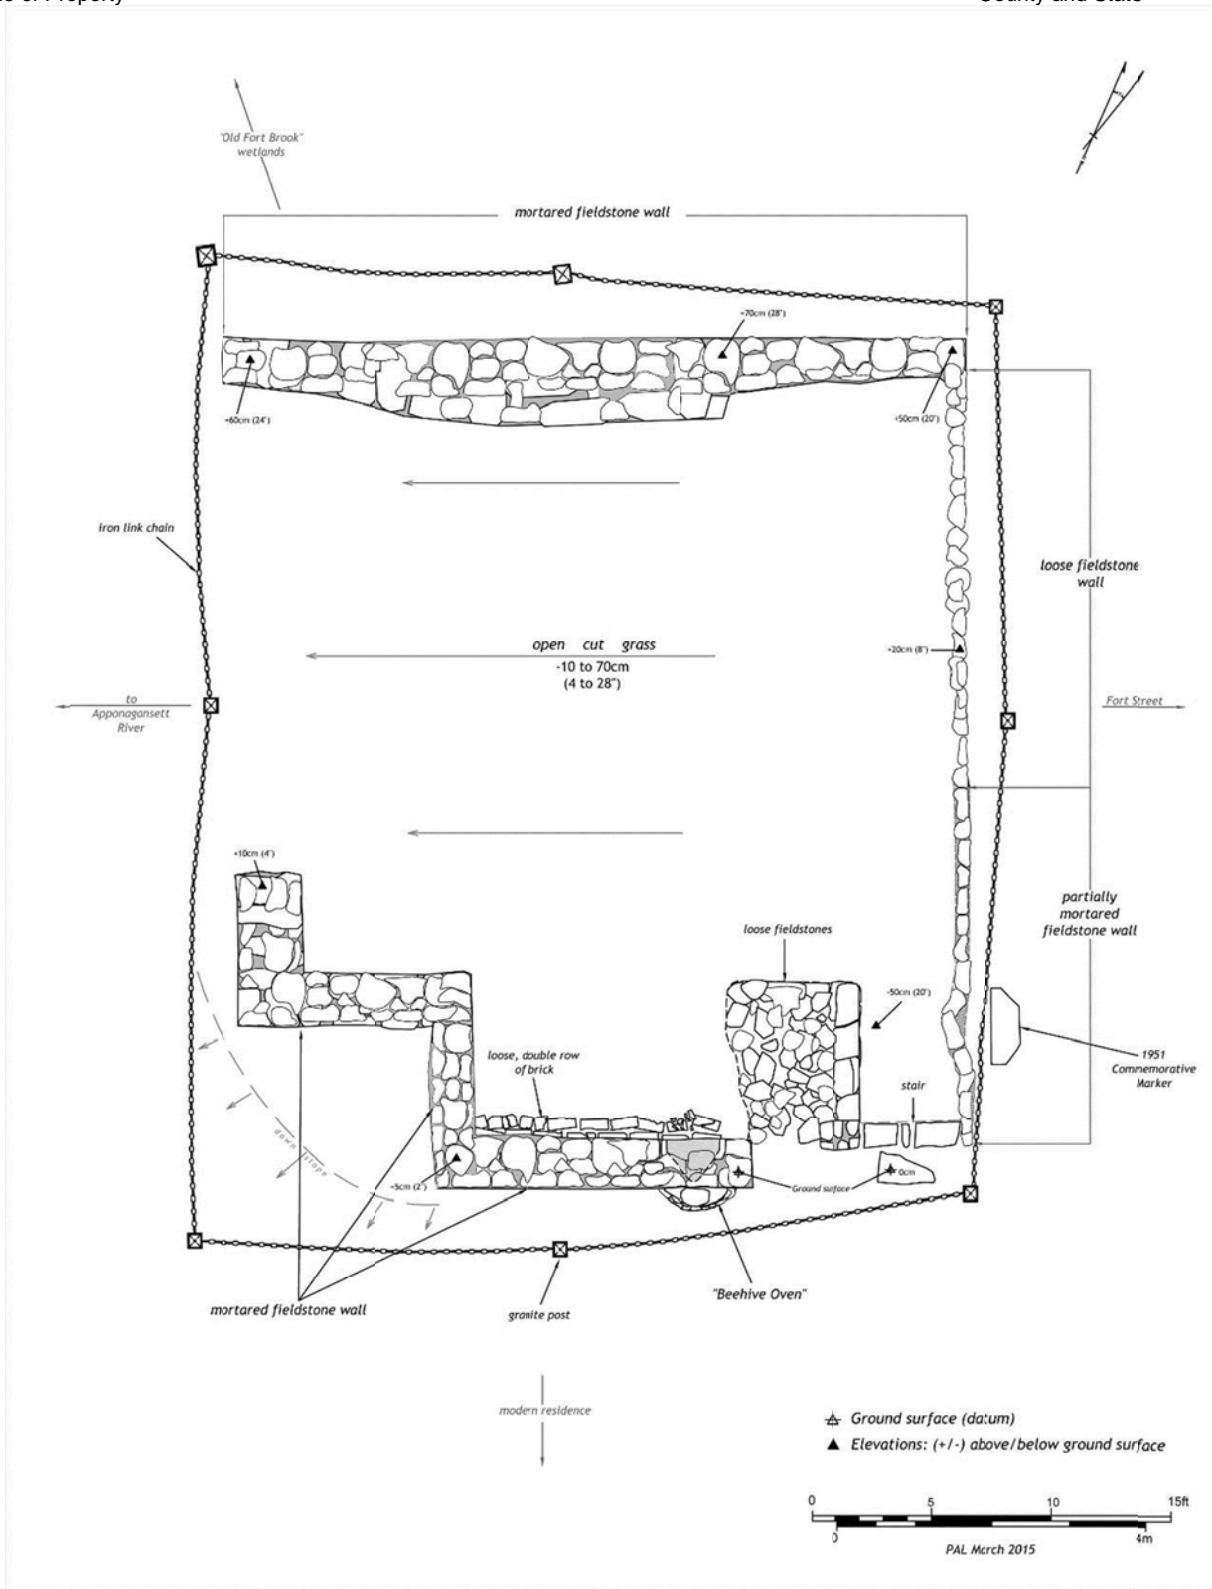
Site plan showing existing conditions, Russell Garrison Site (PAL 2014).
